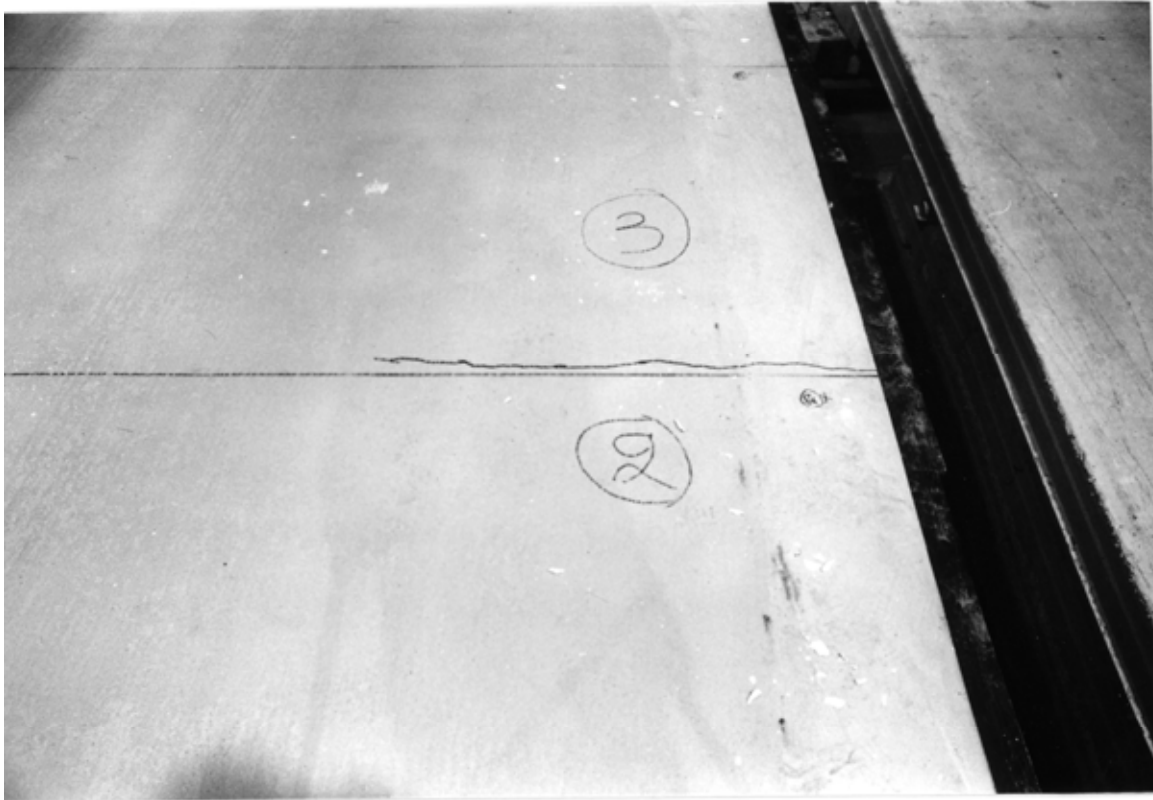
The cracking of the concrete topping and the tie beam between the slab units no 2 and 3.
